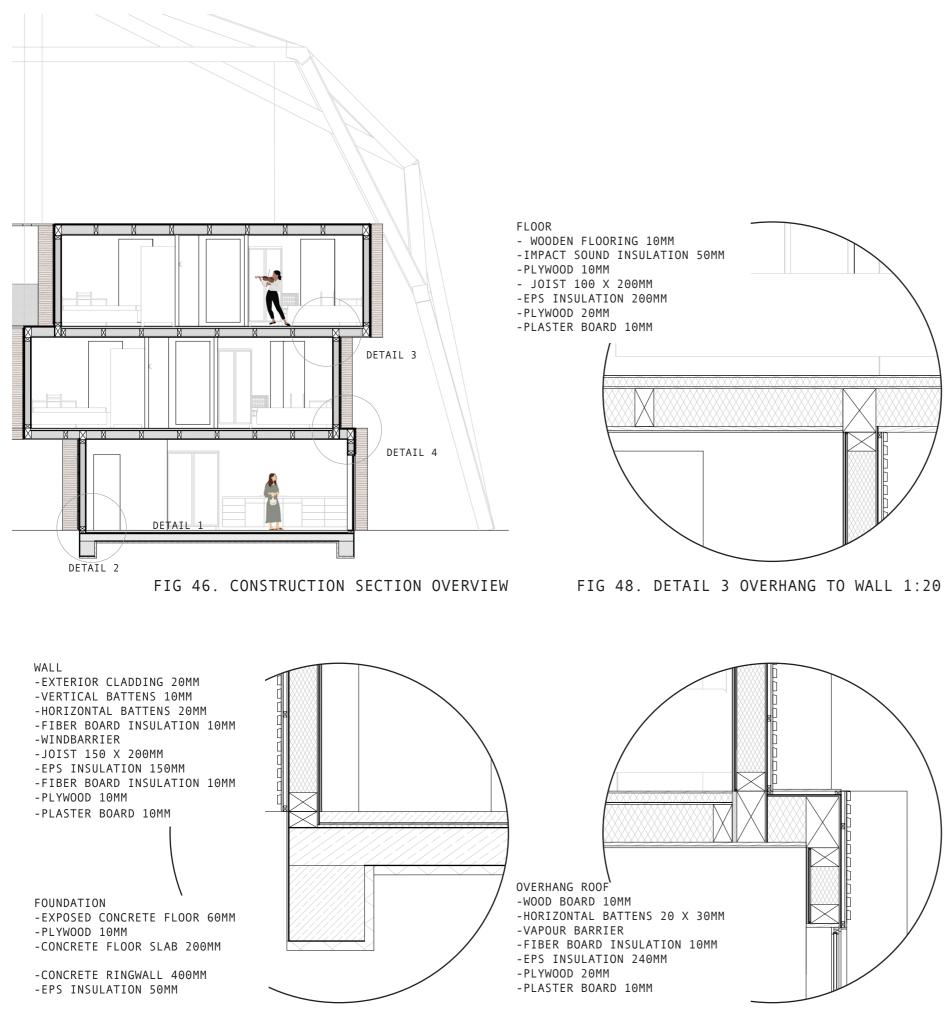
DETAIL 2 WALL TO FOUNDATION 1:20
